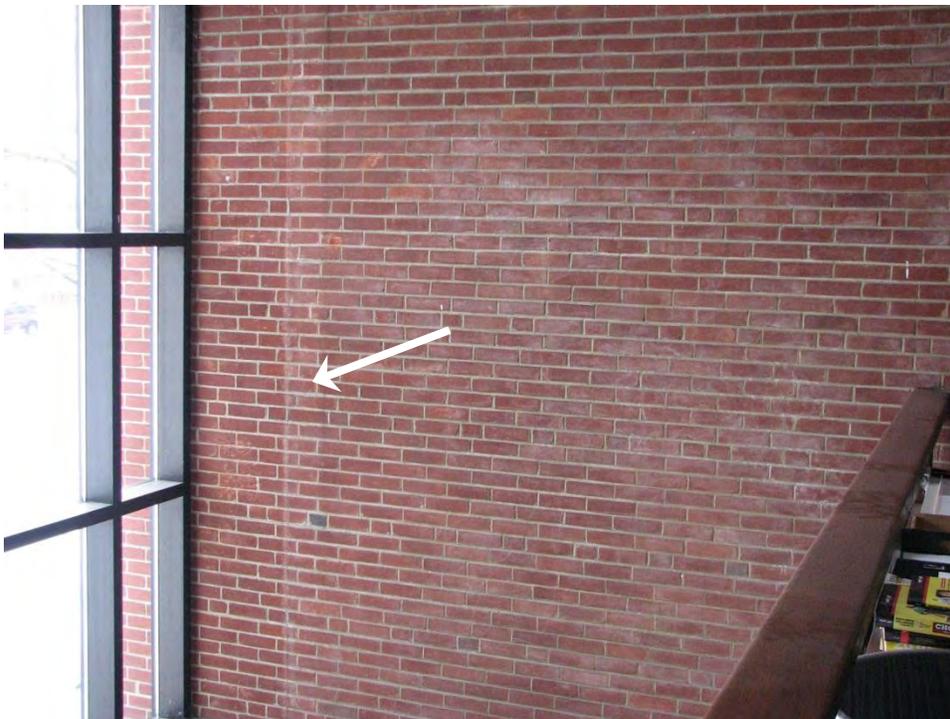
Foyer area of main entrance from second floor of main building (notice ghost marks on masonry likely from original entryway configuration).
